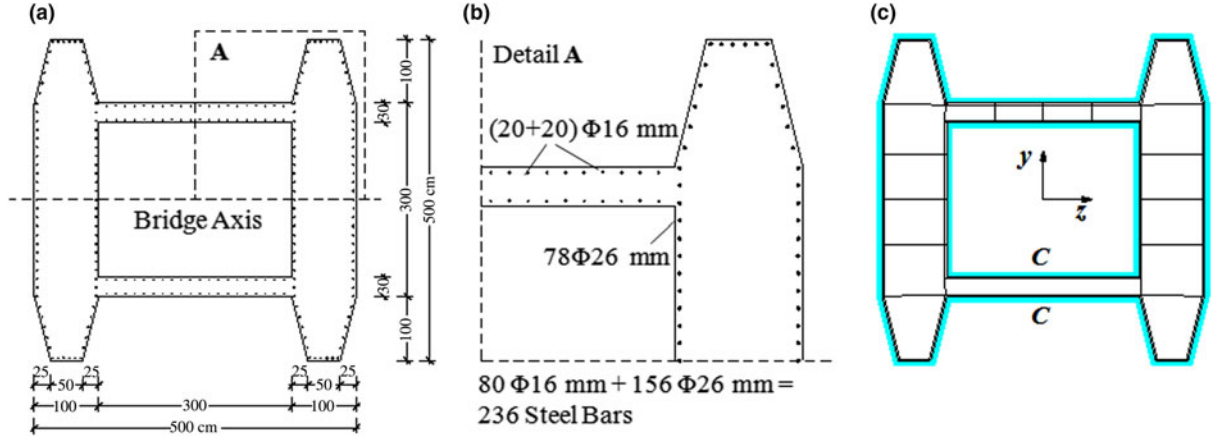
Pier cross-section: (a) geometrical dimensions; (b) reinforcement layout; (c) model of the cross-section and location of the aggressive agent.
